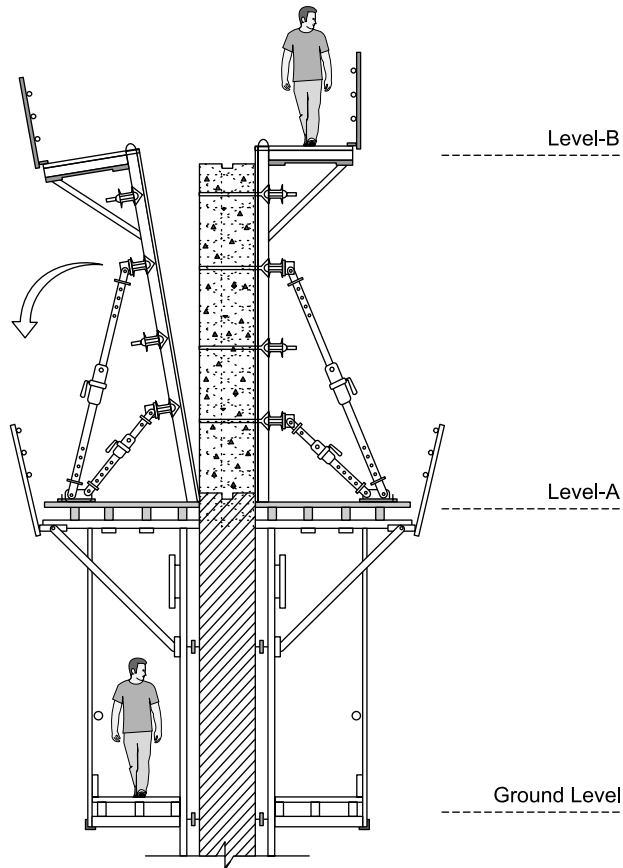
(a) View Showing the Gap Between the Concrete and Wall Form (Tilting Type).
